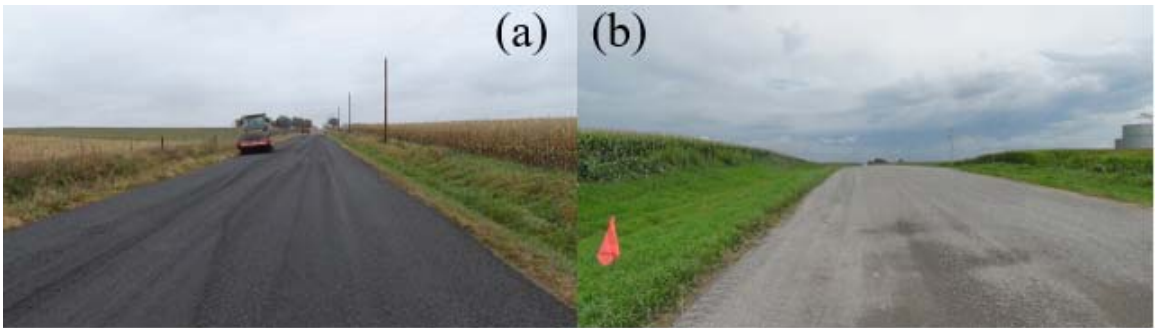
Phoenix steel slag sections at end of construction (a) Cherokee (b) Howard
